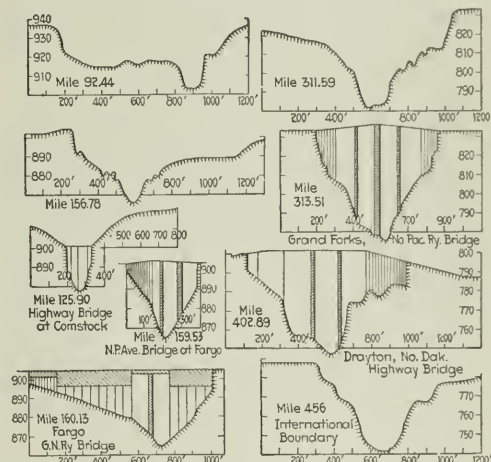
TYPICAL CROSS-SECTIONS OF RIVER
